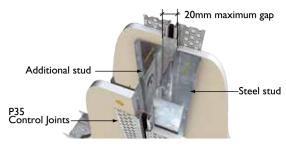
STUD WALL CONSTRUCTION WITH CONTROL JOINT
